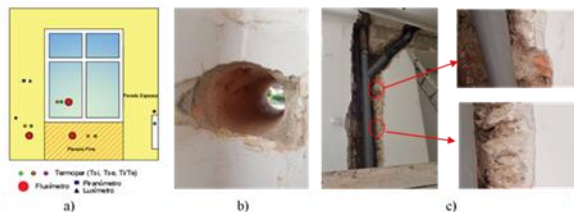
a) Schematic representation of sensors' placement in the Psychology office; b) Transverse bore in the thin massive brick wall; c) Detail of thick stone masonry wall.
